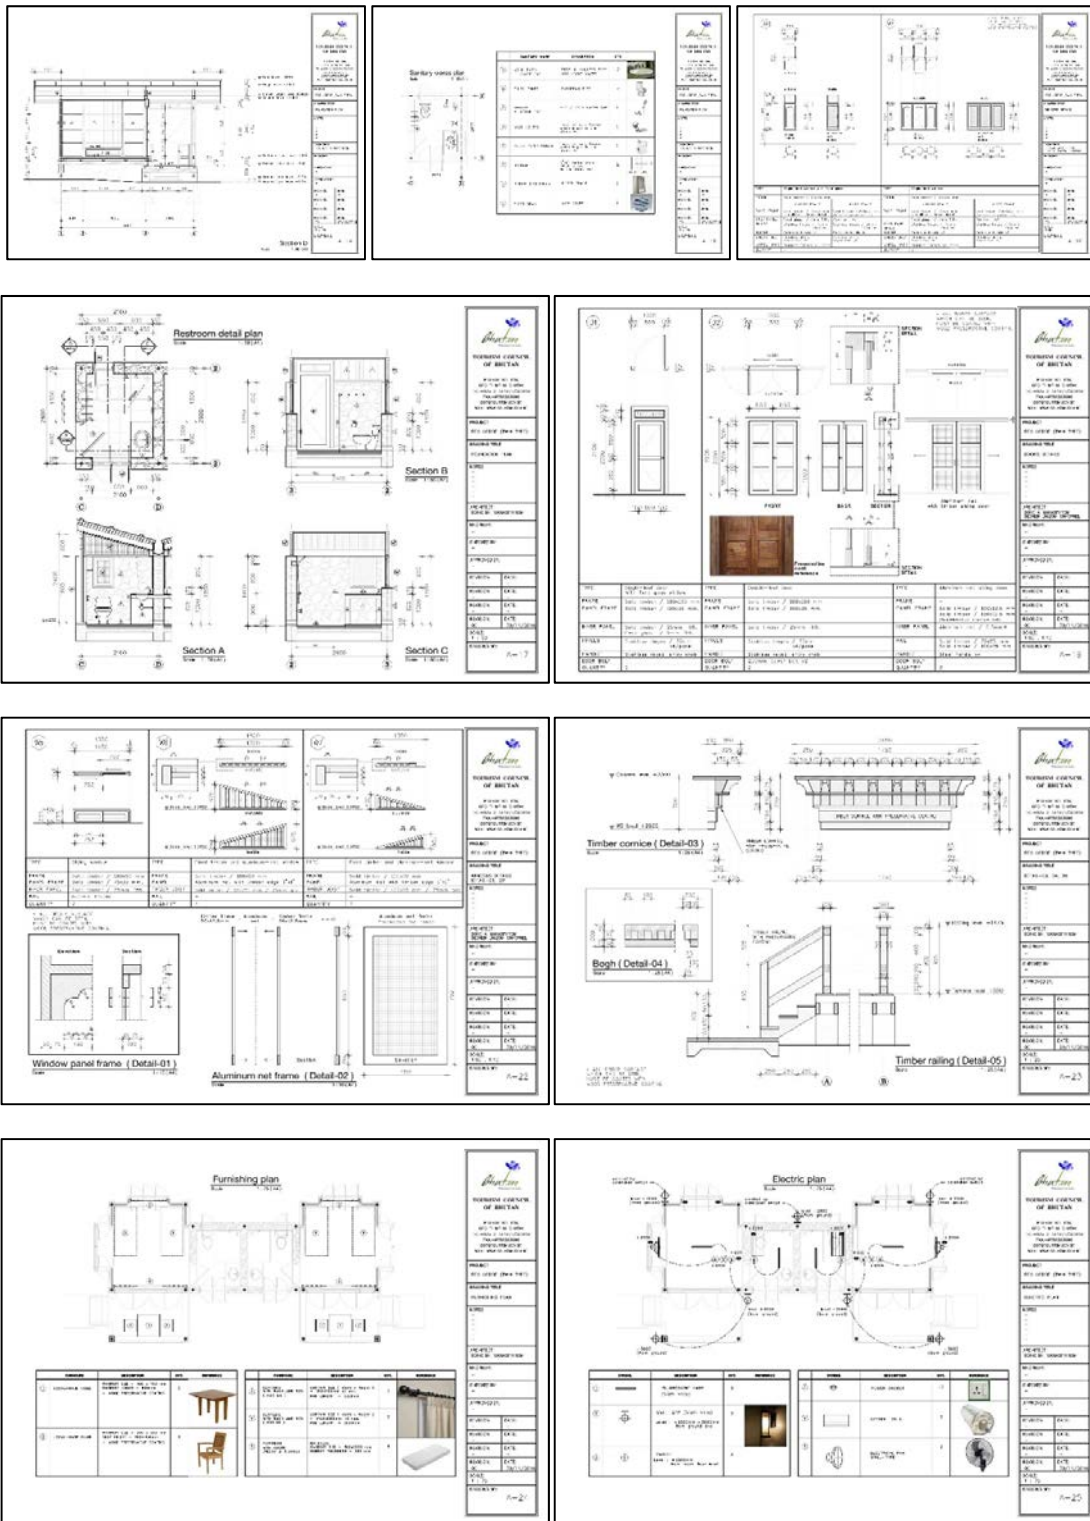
Construction drawings of twin type villa at Manas eco lodge.
